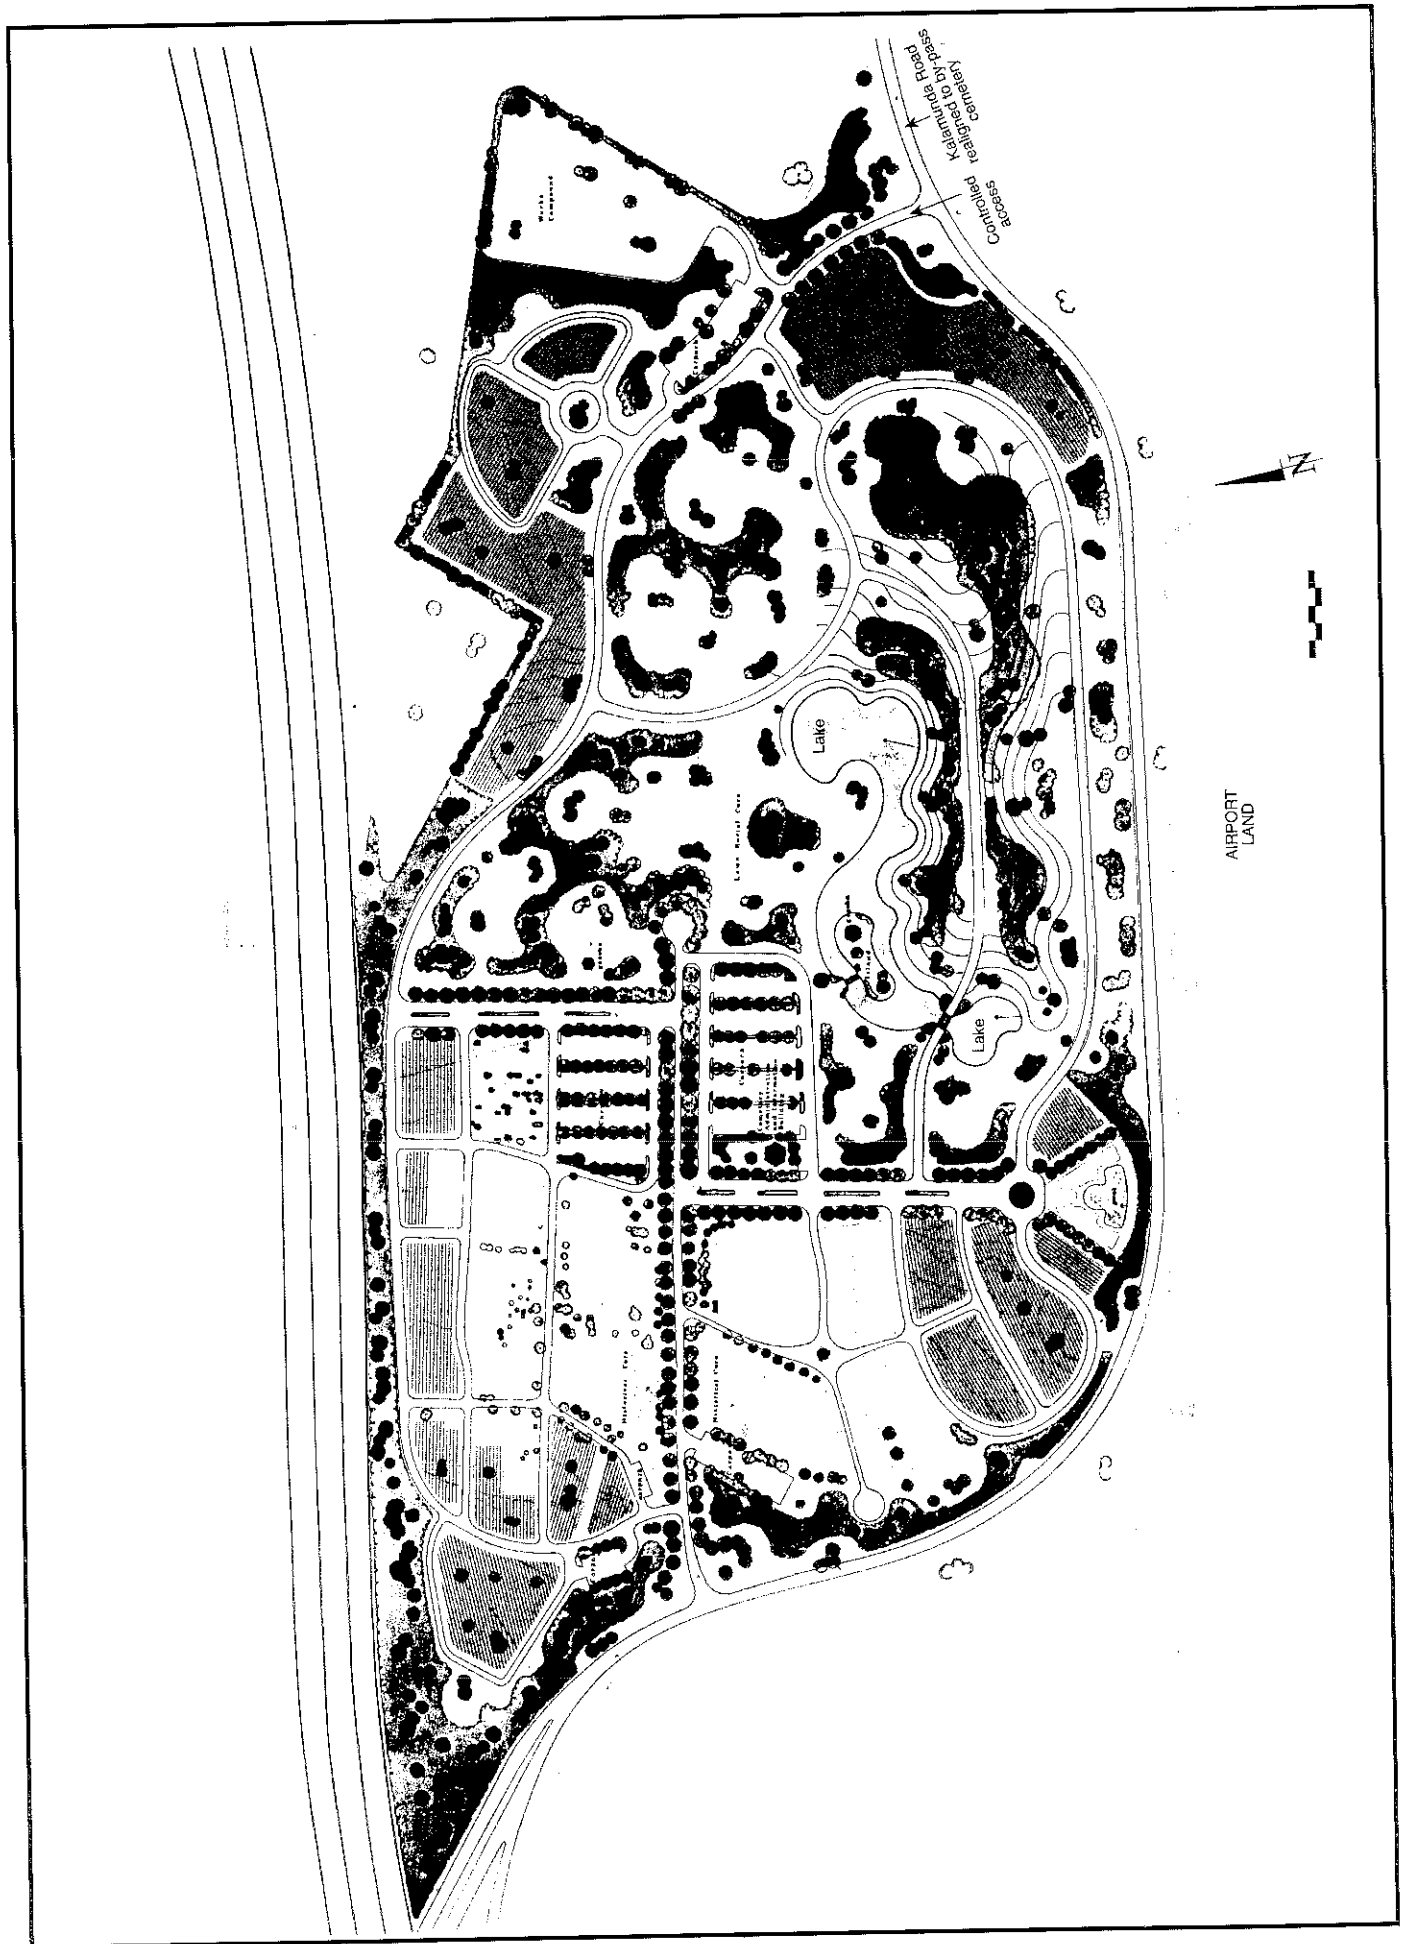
Guildford Cemetery Concept Plan. (Source: Metropolitan Cemeteries Board, Guildford Cemetery, PER, 1998.)
